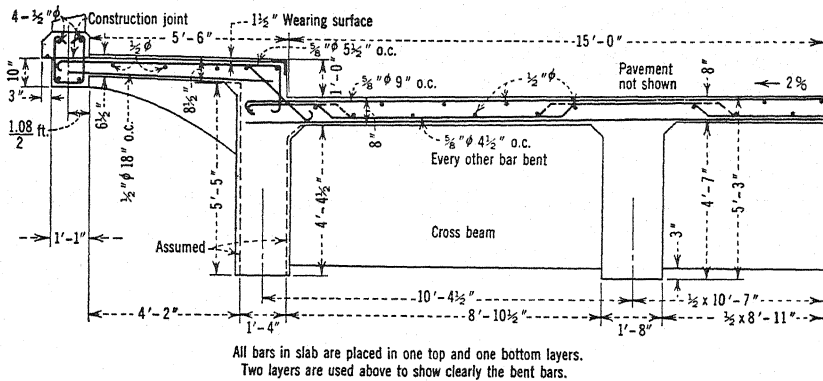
Cross Section of Bridge. (See p. 60.)
